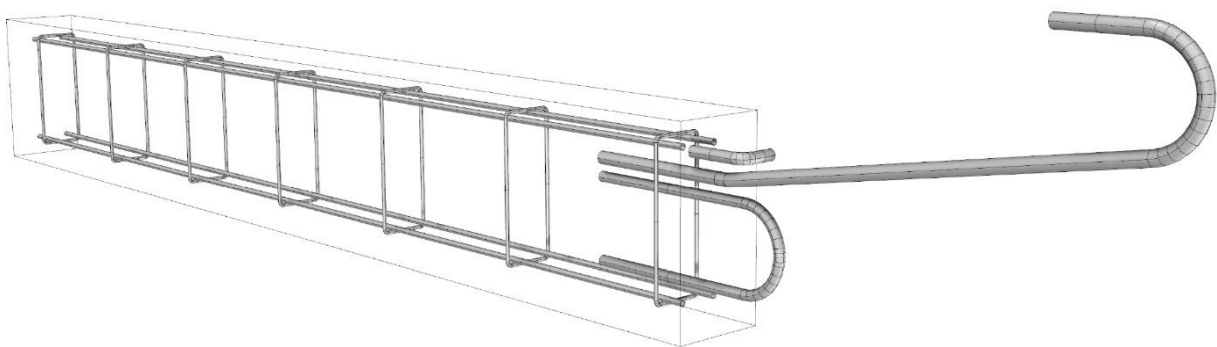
3D drawing of the non-instrumented concrete element including reinforcement and inserts.
